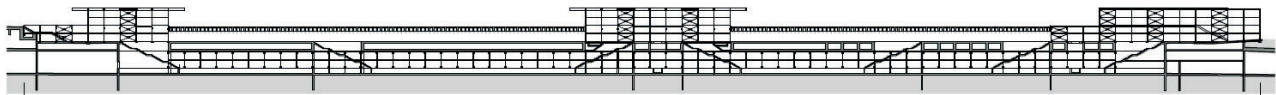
Longitudinal section of Genève – Eaux-Vives station
